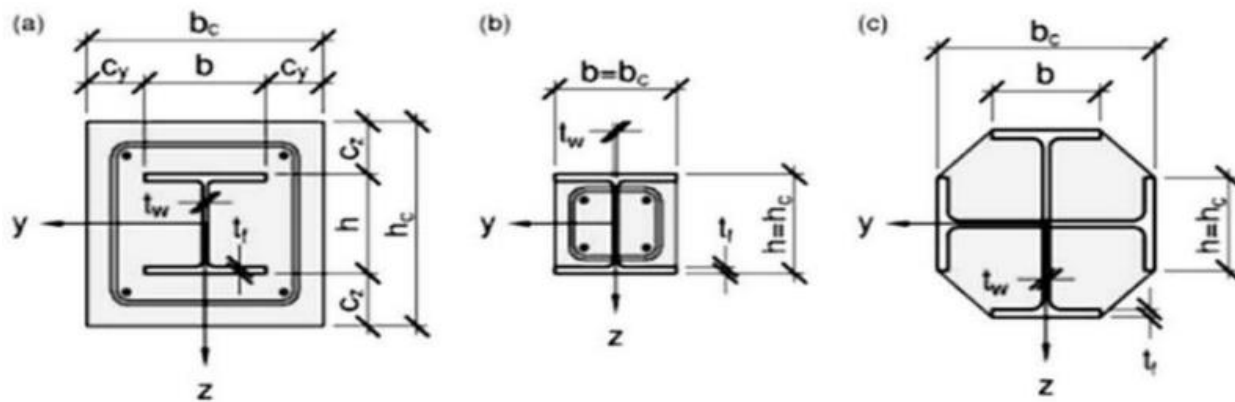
Typical Cross-Section of Composite Columns with Fully or Partially Concrete Encased H-Section(ES EN 1994, 2015)
